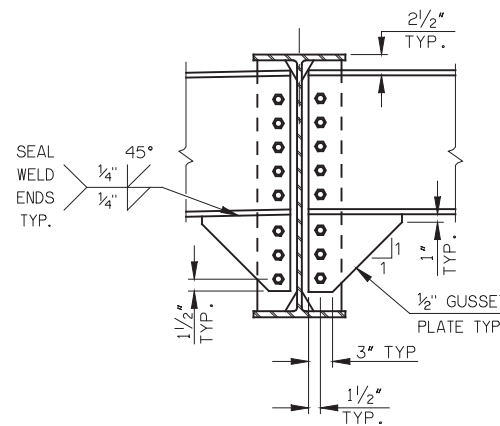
DETAIL SHOWN AT INTERIOR BEAM. OMIT BOLT HOLES IN
